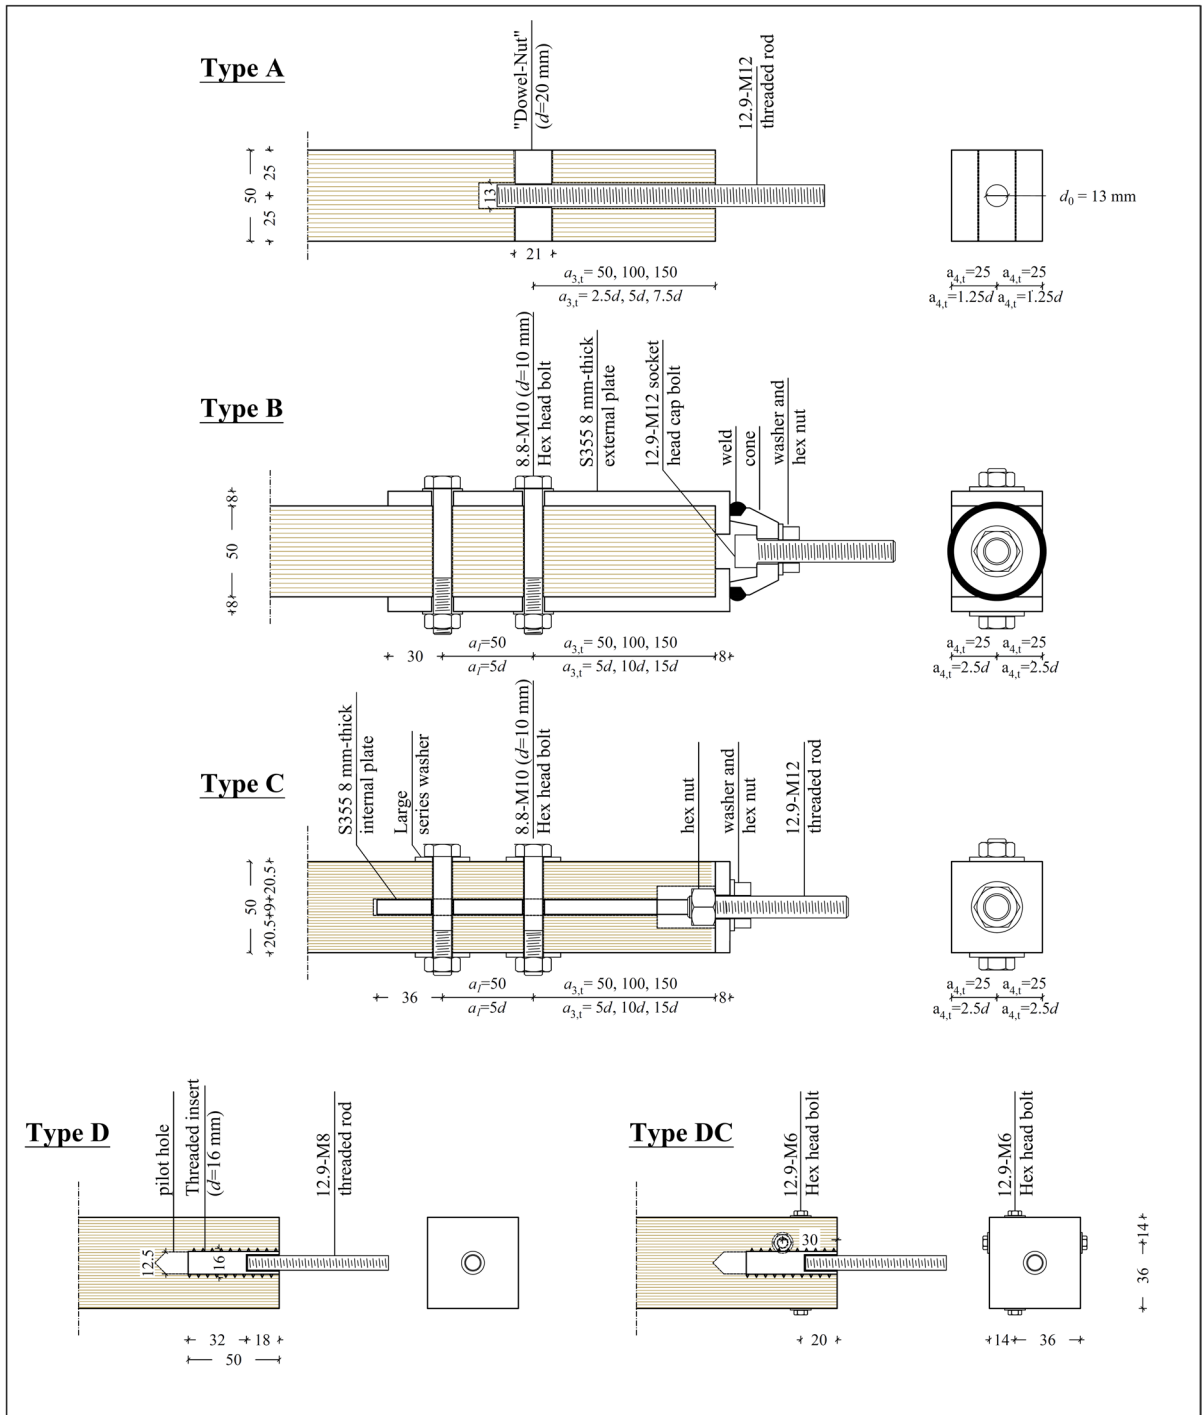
Construction details of the tested specimens. Dimensions in mm
